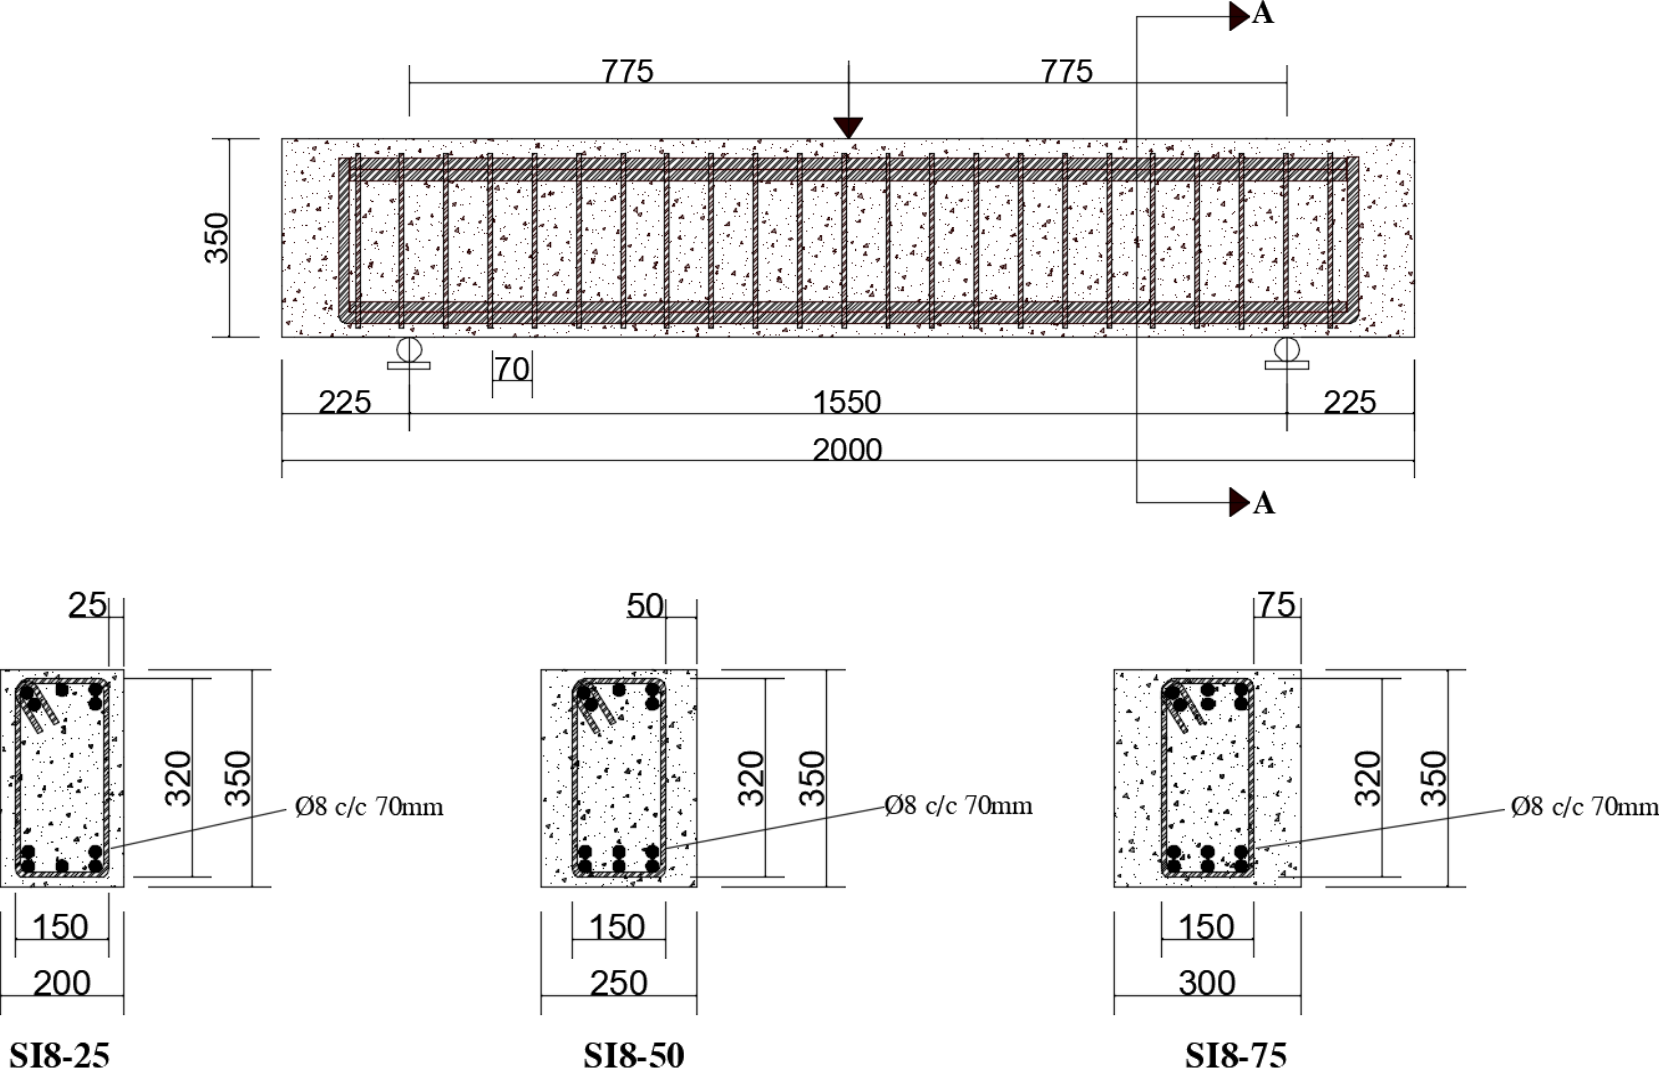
Cross Sectional Detail of Main Specimens SET I (All Dimension are in mm)
